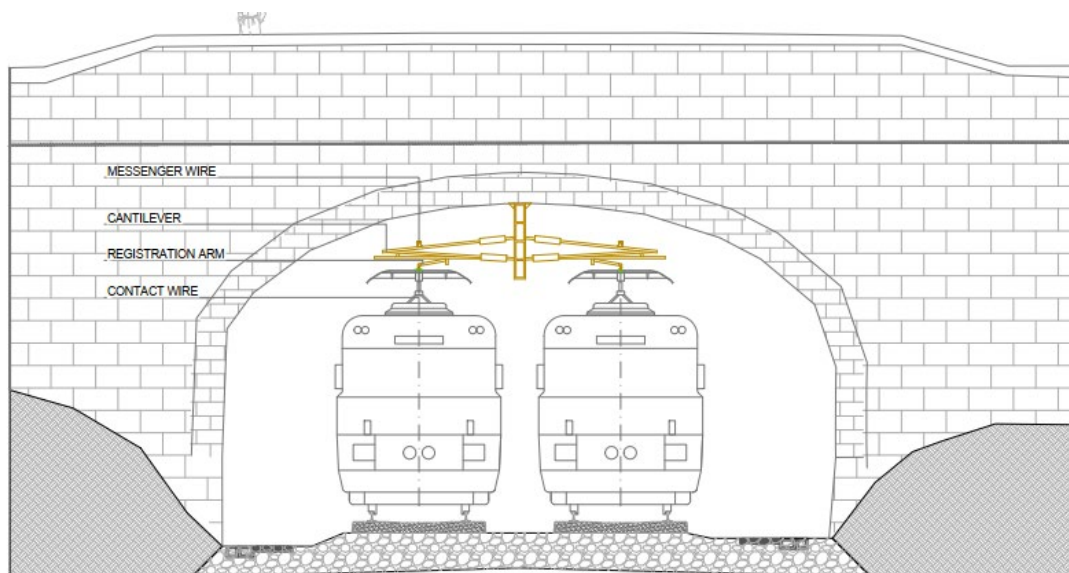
Typical OHLE Tunnel Cantilever Arrangement
